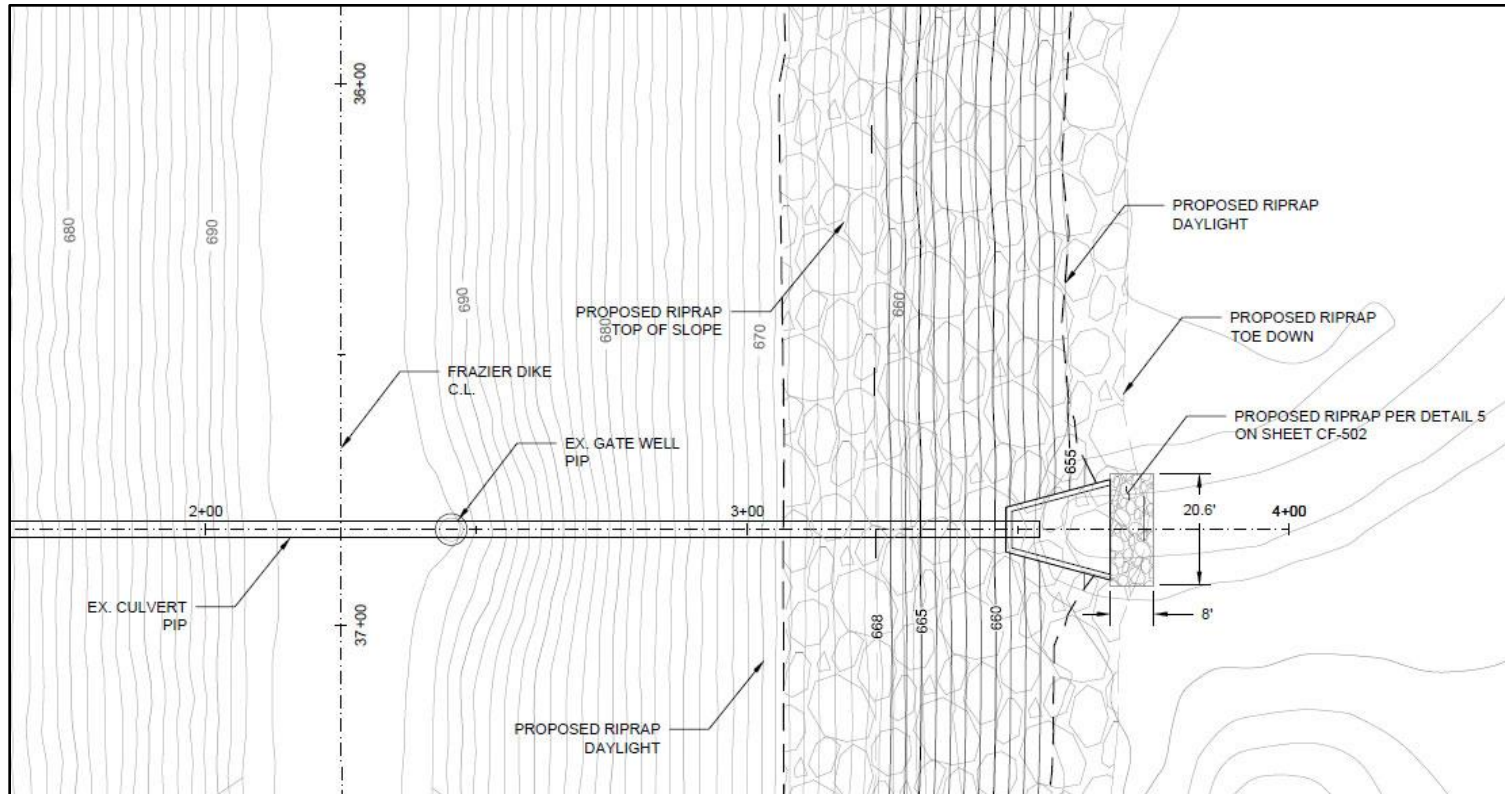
Top view of Frazer Dike showing how the end of the existing CMP would be encased by a new reinforced concrete headwall structure.
